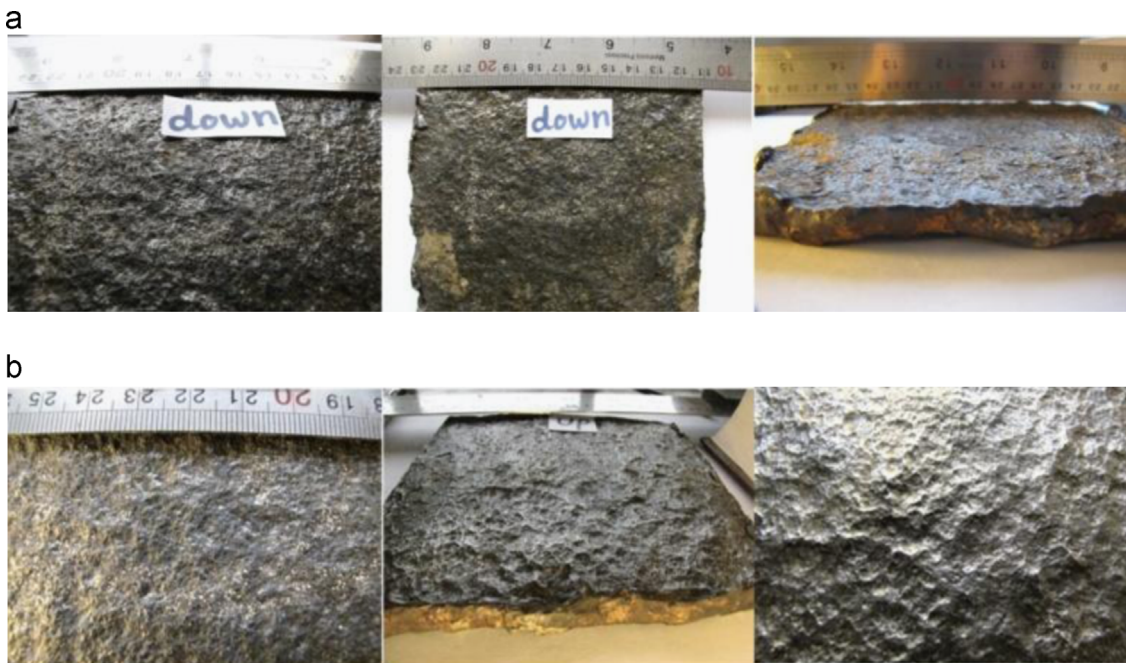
Plate with general corrosion. (a) Lower surface. (b) Upper surface.
